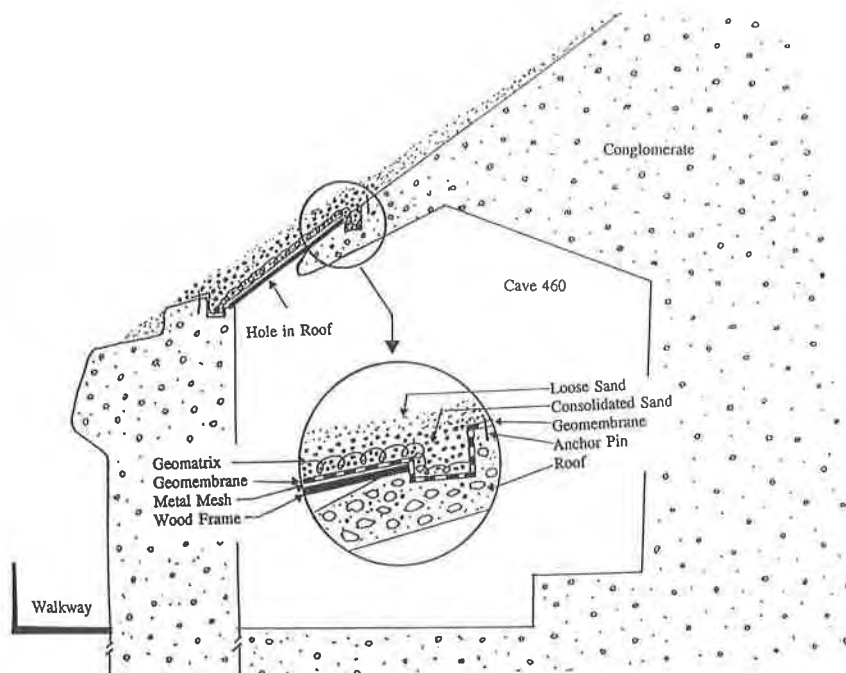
Cross-section through thin-roofed grotto showing geocomposite cap over hole and detail of construction and installation.
